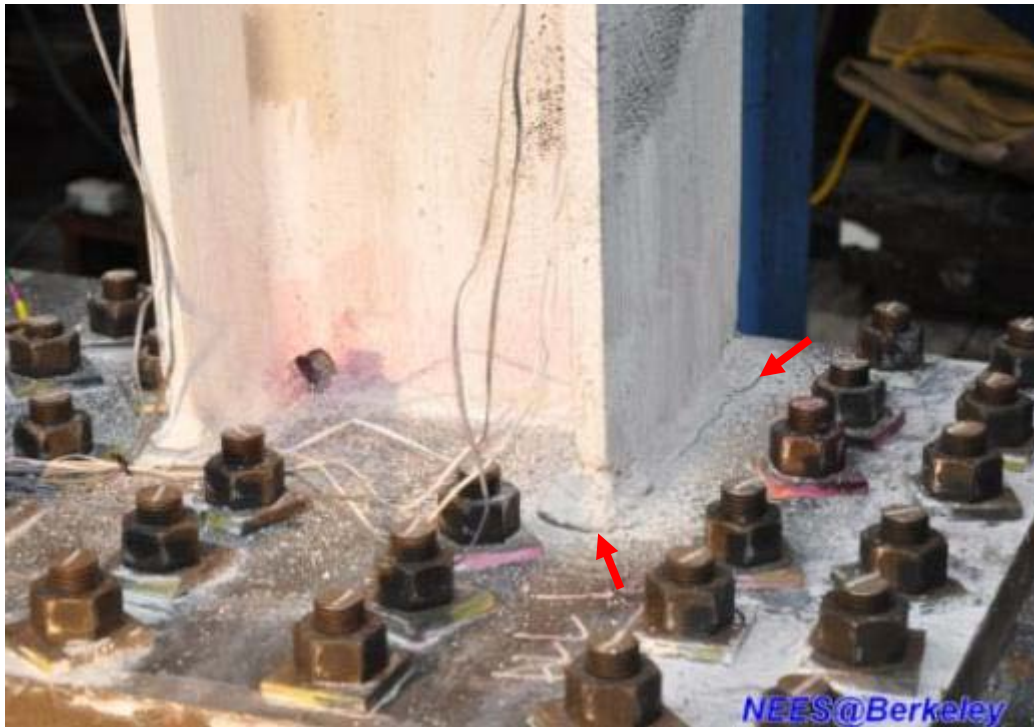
Crack near the flange CJP welds at west side column base (Specimen TCBF-B-2)
